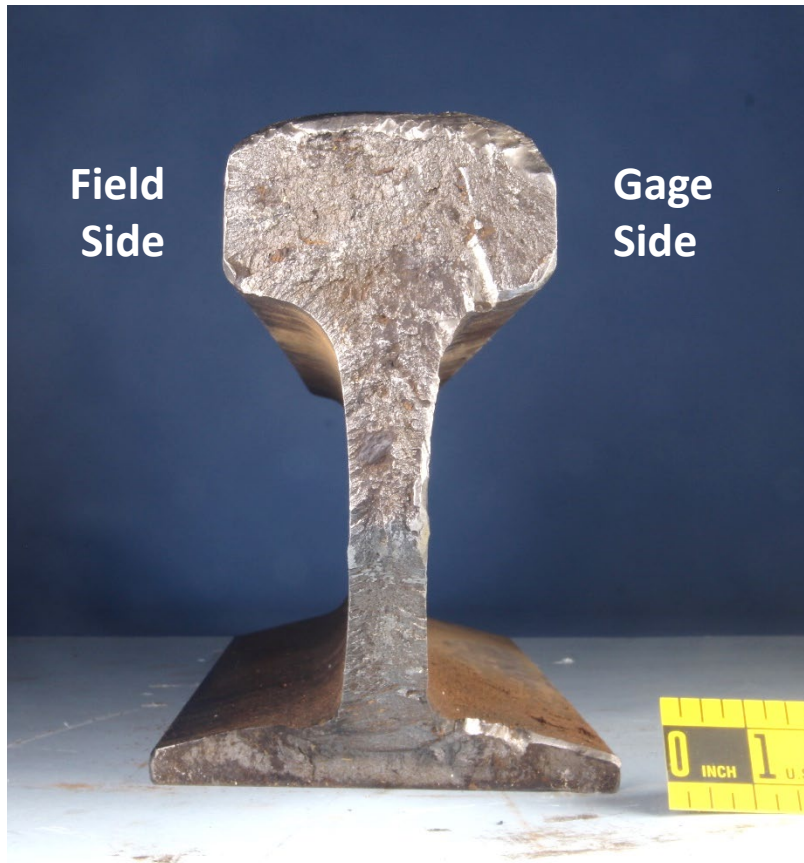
Macro photos of the fracture surface on piece 3W.
